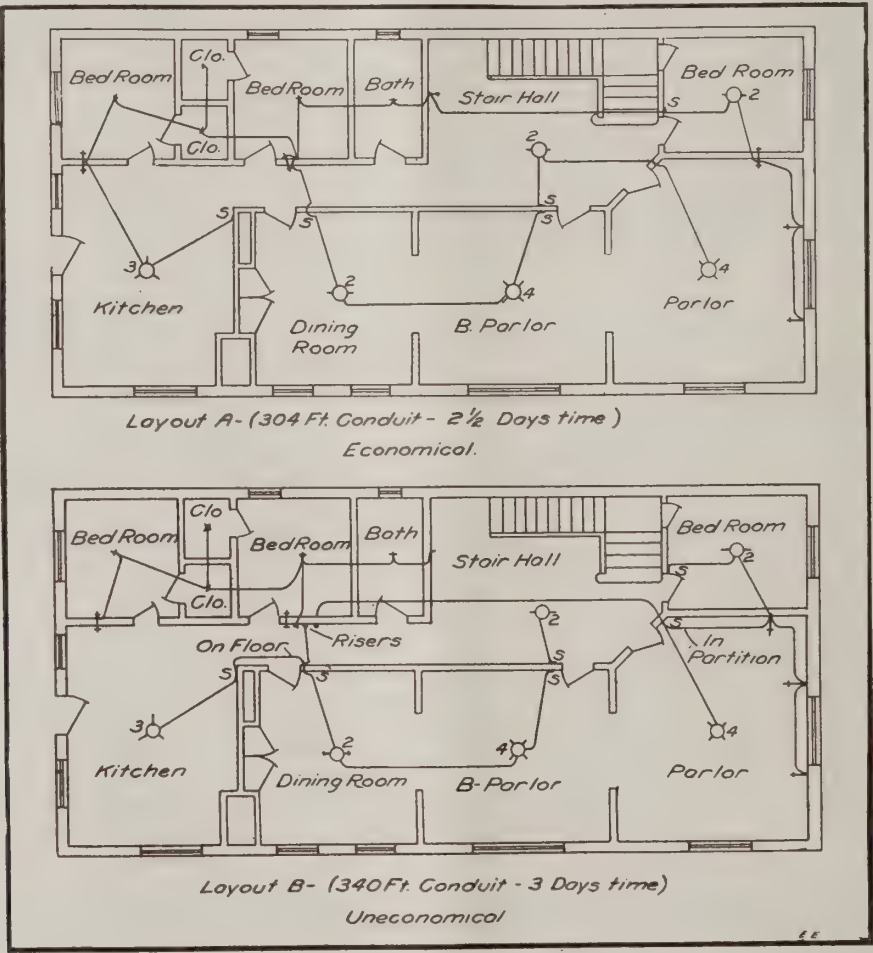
WASTEFUL AND EFFICIENT CONDUIT LAYOUTS.
